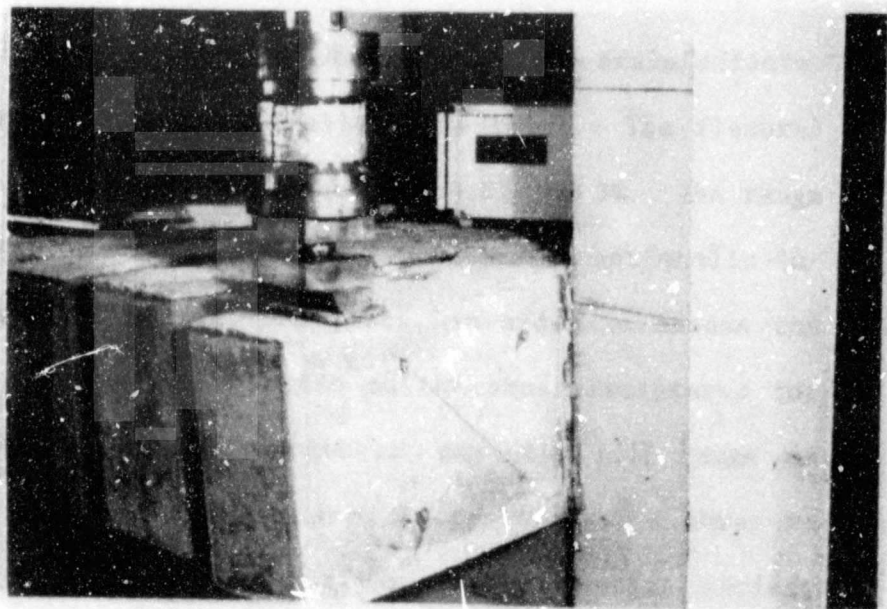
PHOTOGRAPHS SHOWING GENERAL VIEW OF THE PRISMATIC CORBELS TESTED AND A DETAILED VIEW OF A TYPICAL DIAGONAL SHEAR CRACK.
